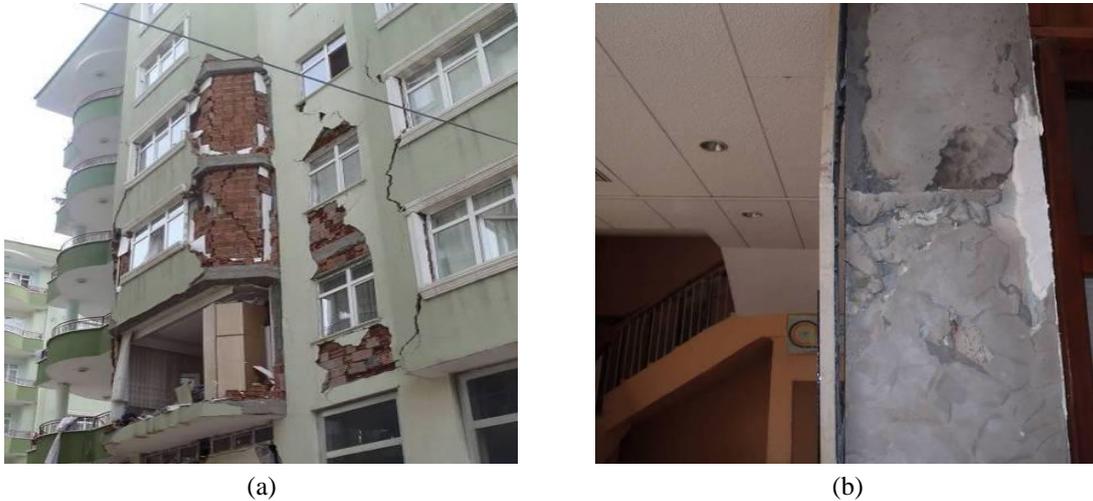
(a) building with partially collapsed infill walls due to deficient insulation applications and (b) heavy cladding partially separated from the wall
